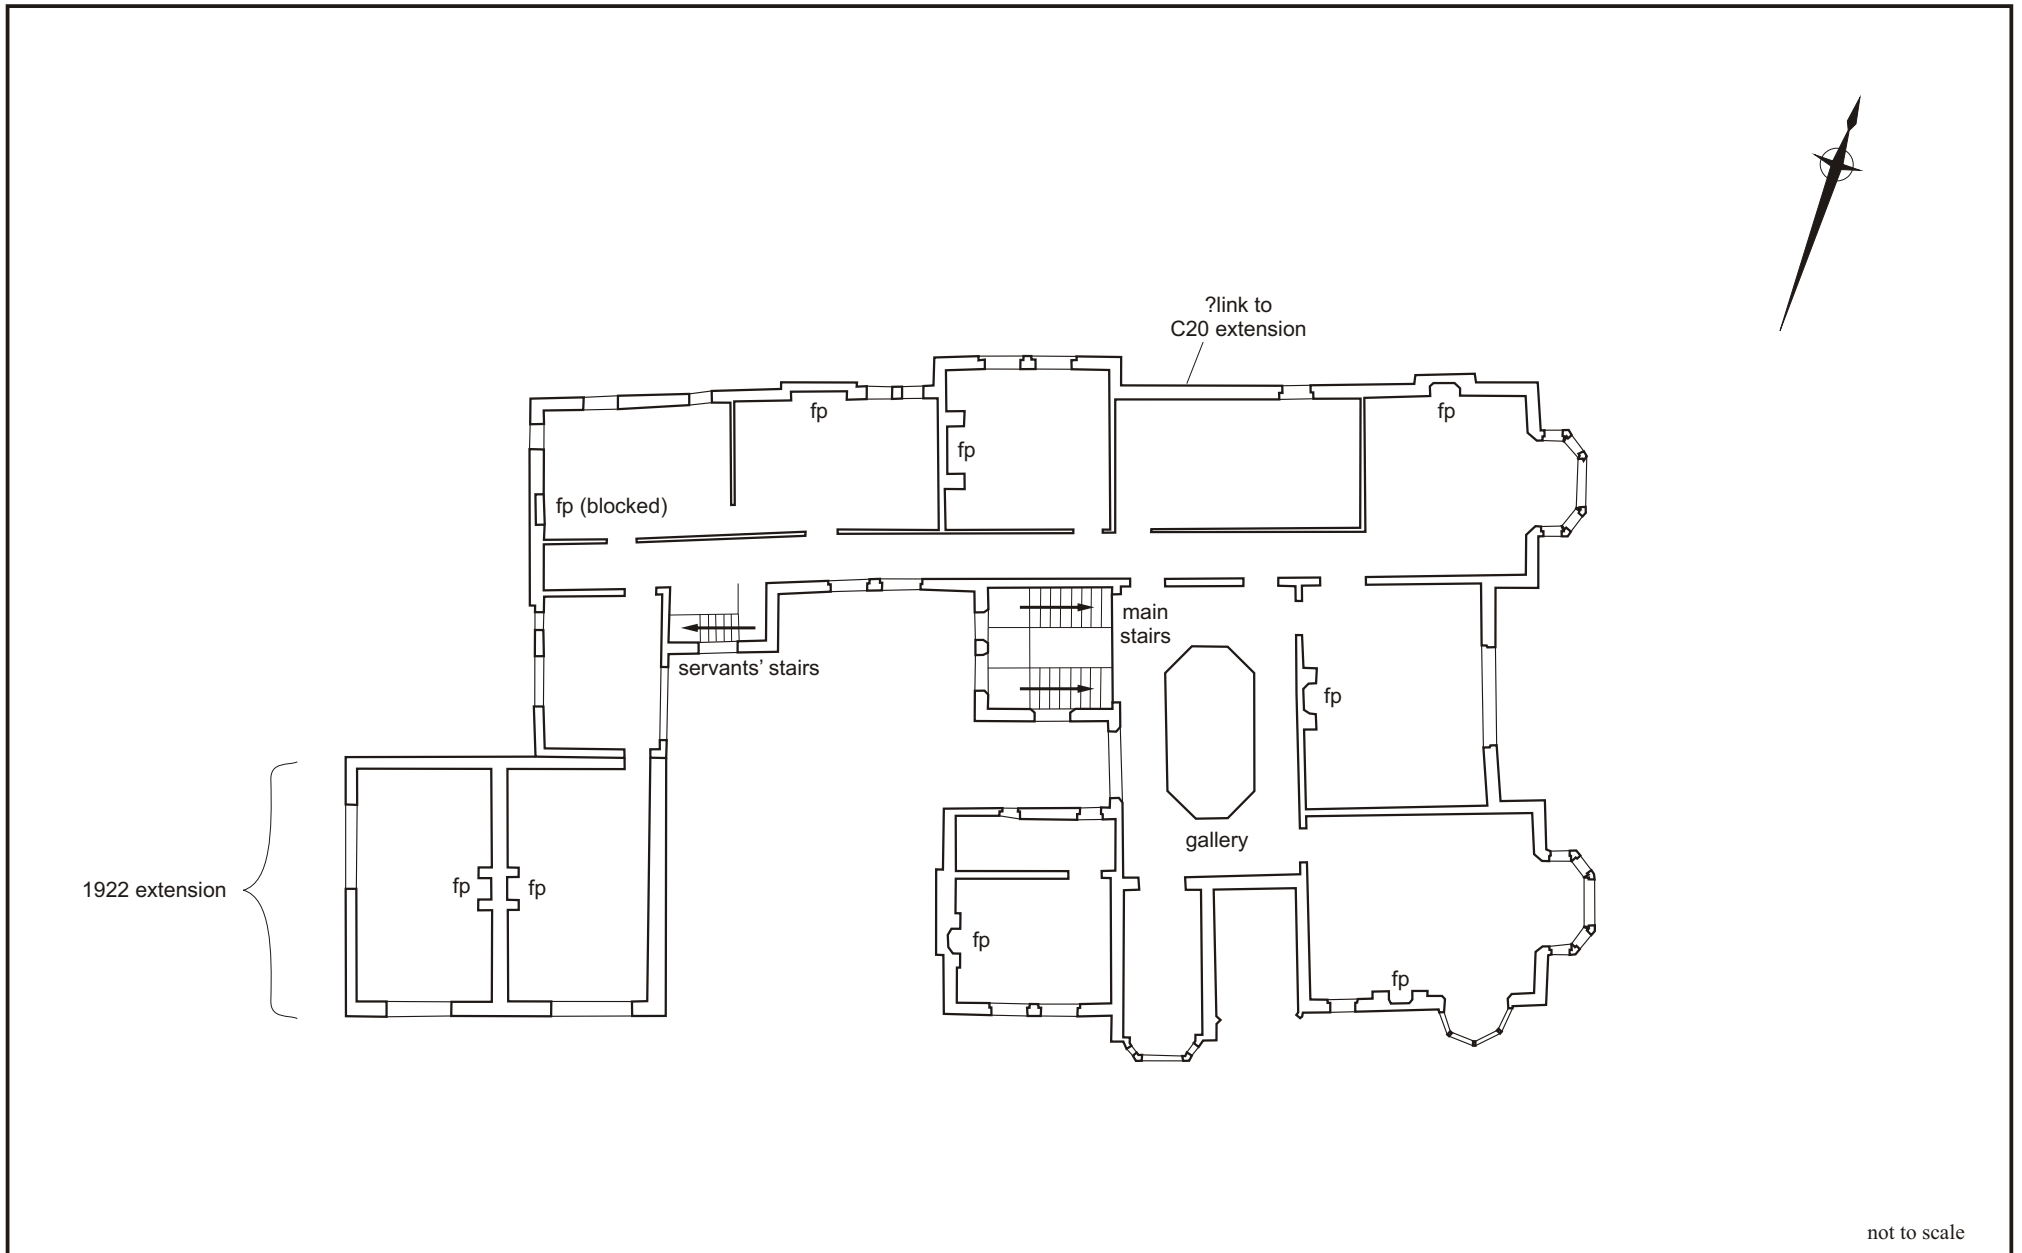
First-floor plan of Crossmead Hall, based on James Crocker's 1893 ground-floor plan of the building. The internal arrangement is based on photographs by D. Lewis, and is partially conjectural.
